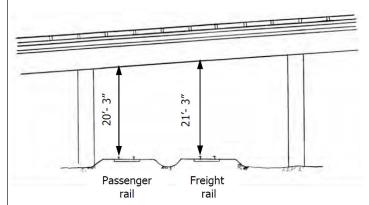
Bridge elevation view with one passenger rail and one freight rail track below the bridge.
